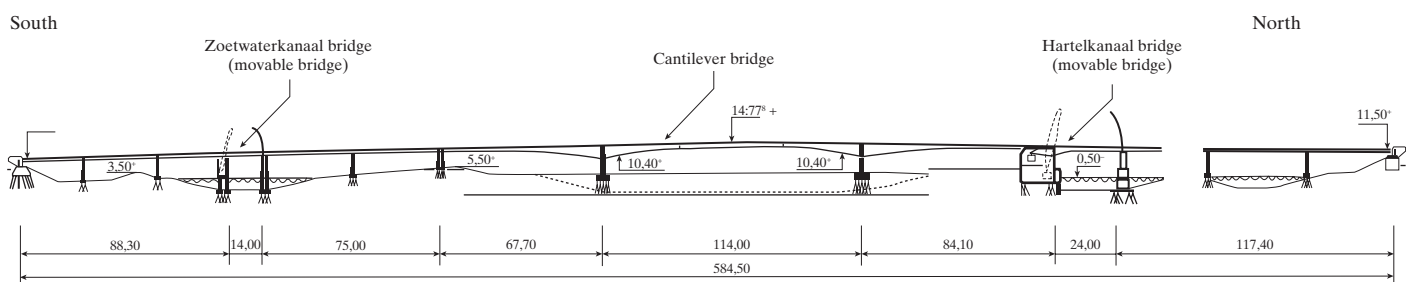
Longitudinal cross section of the Hartel Bridge (units in m)
